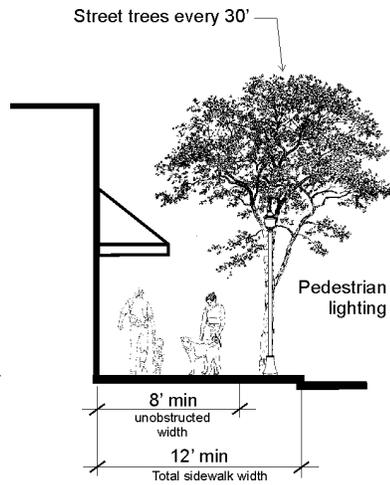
Minimum internal walkway requirements along the facades of retail buildings 100 feet or more in width.
